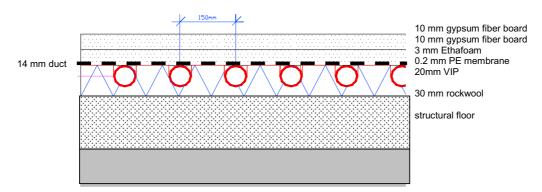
Principle construction layout of an acoustically improved dry VIP based floor heating system (concept 1)
